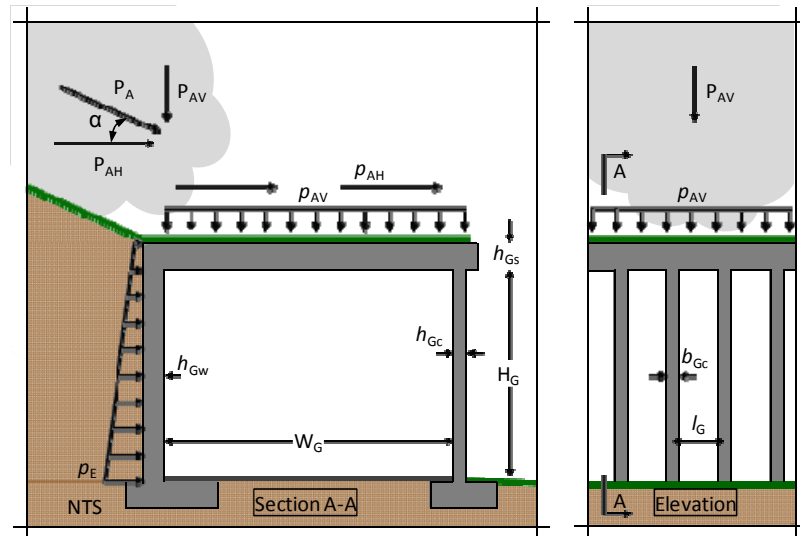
Jaun Pass structural analysis schematic in a) cross section and b) elevation.
